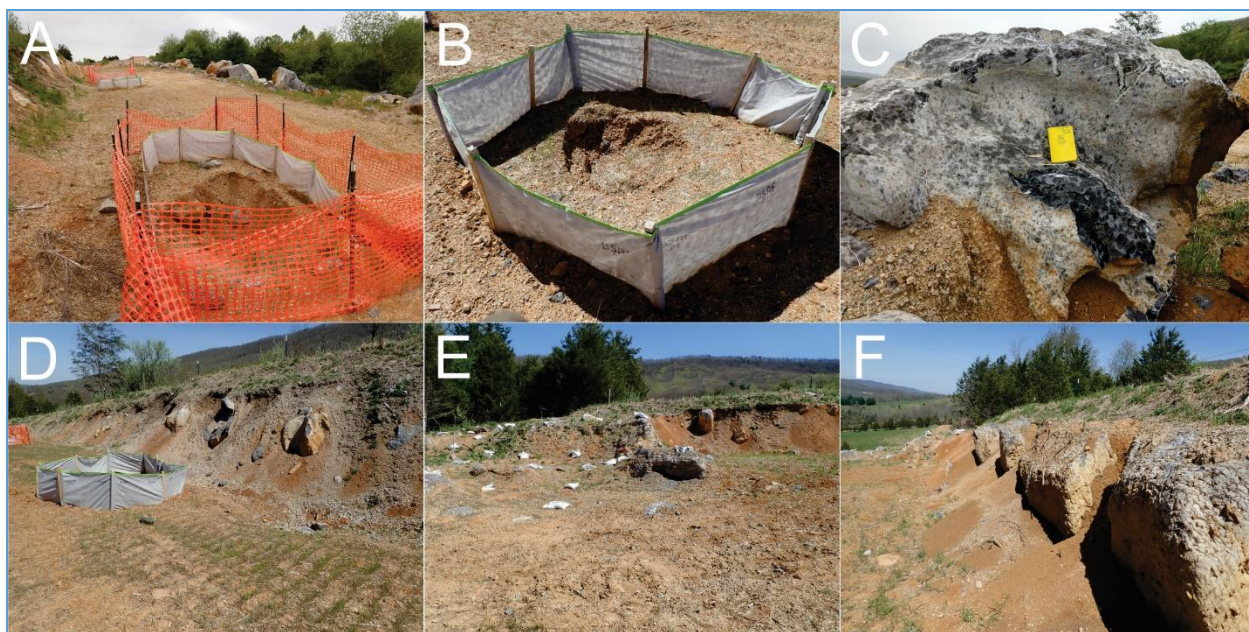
Area of subsidence over area blasted but not excavated, Giles County, Mountain Valley Pipeline, 2019 2020. (A – sinkhole with bedrock exposed, B – sinkhole exposing soil, C – dissolution features on excavated limestone block, D – sinkhole at base of cut slope, E – boundary between blasted and unblasted area, F – epikarst surface
